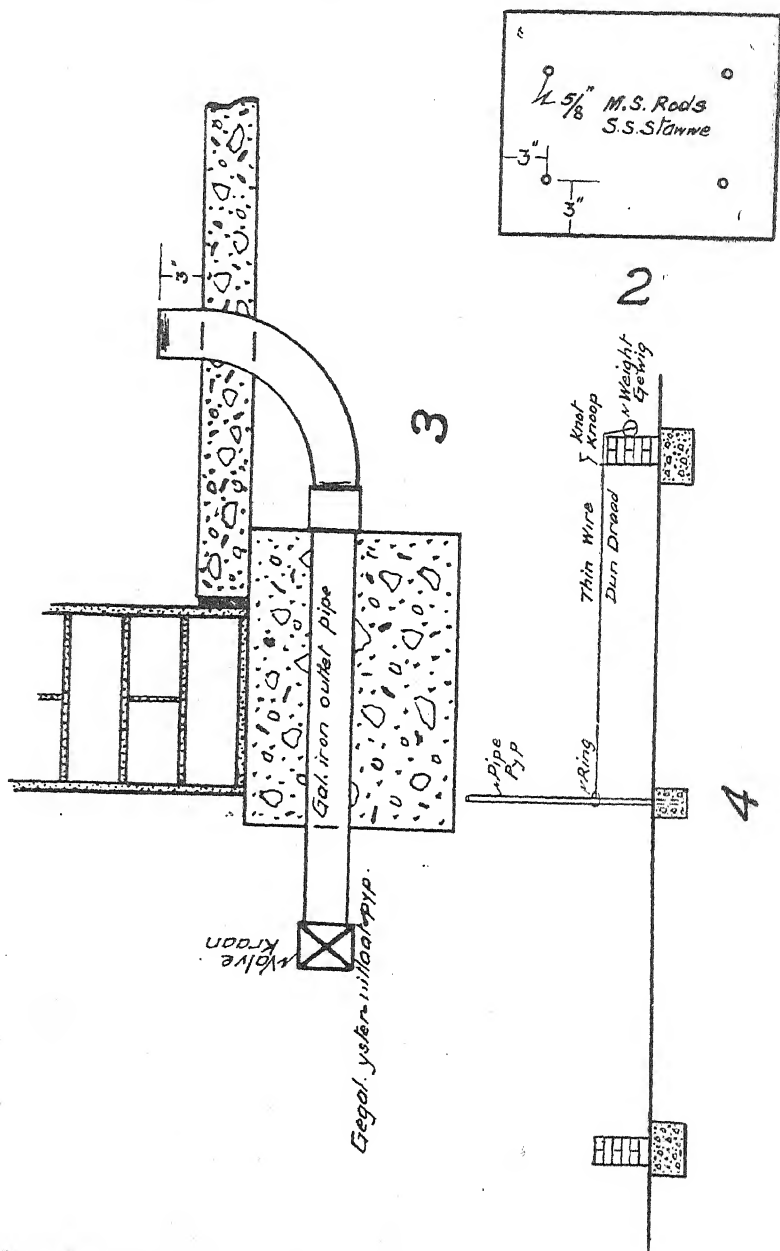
Foundation reinforced top and bottom with mild steel rods.
